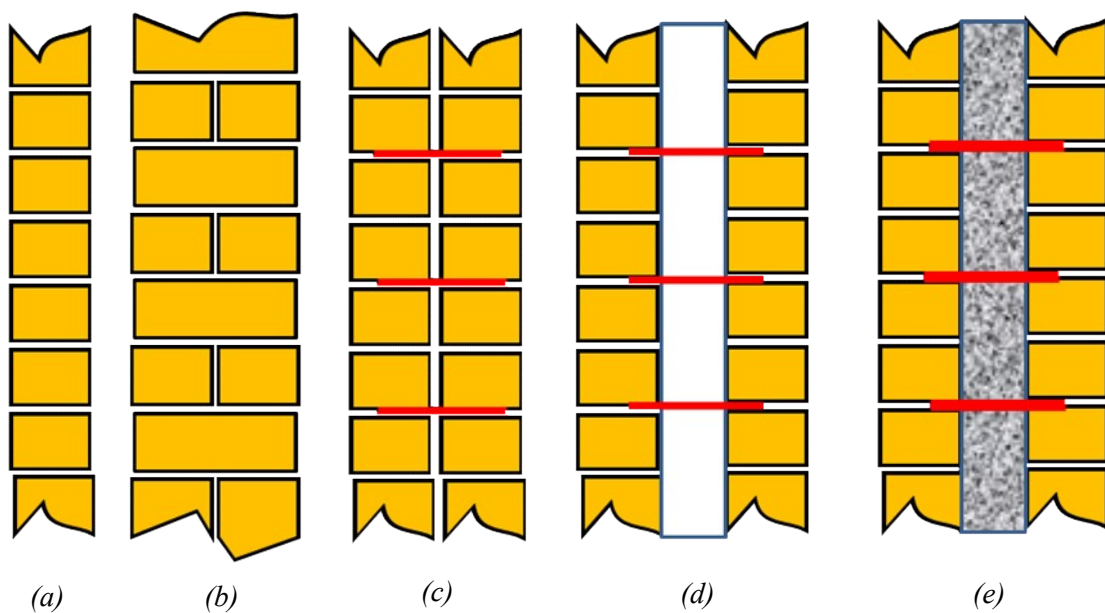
Cross section of different types of masonry walls; a) single leaf (half brick), b) single leaf (whole brick), c) double leaf, d) cavity wall, e) cavity wall (infilled with concrete)
